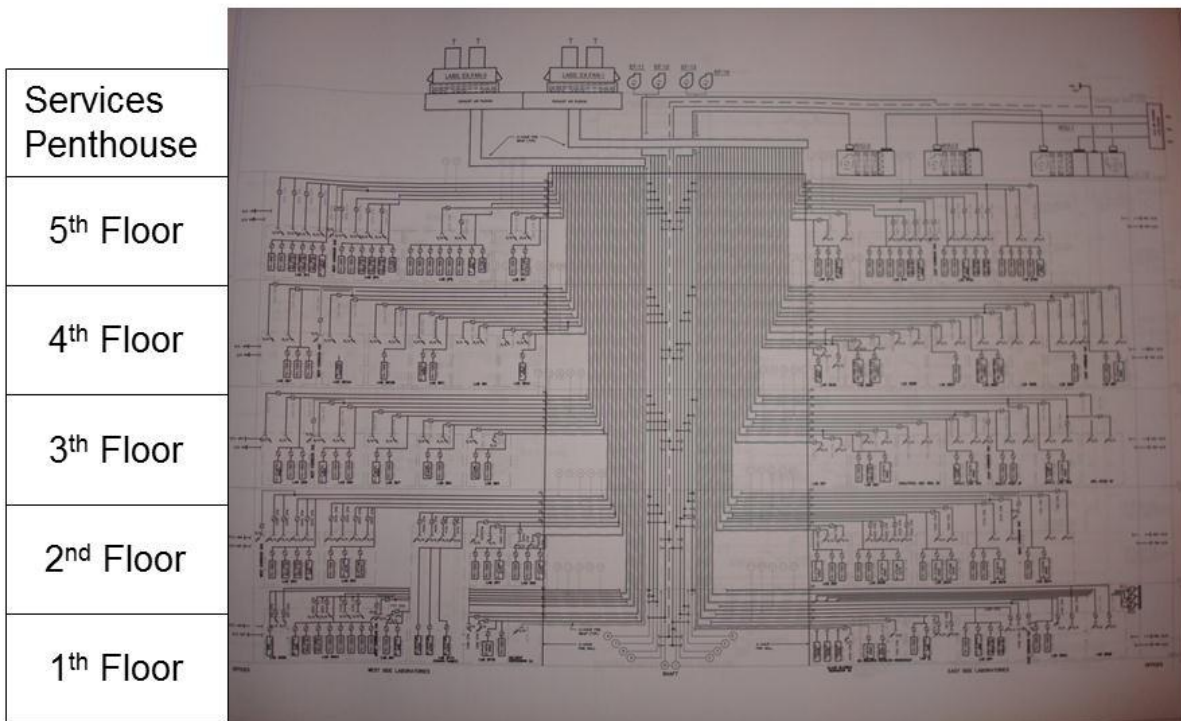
Elevation View of the Piping Network for Engineering VI Building
